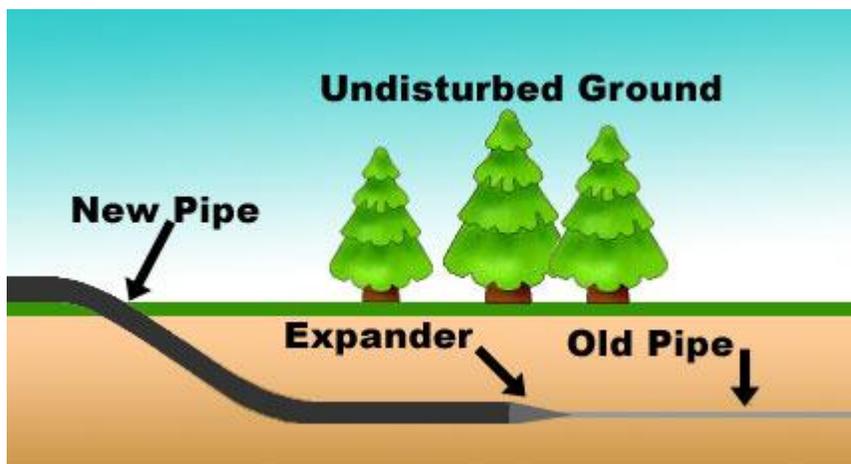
Pipe bursting (Courtesy of Advanced Underground)
